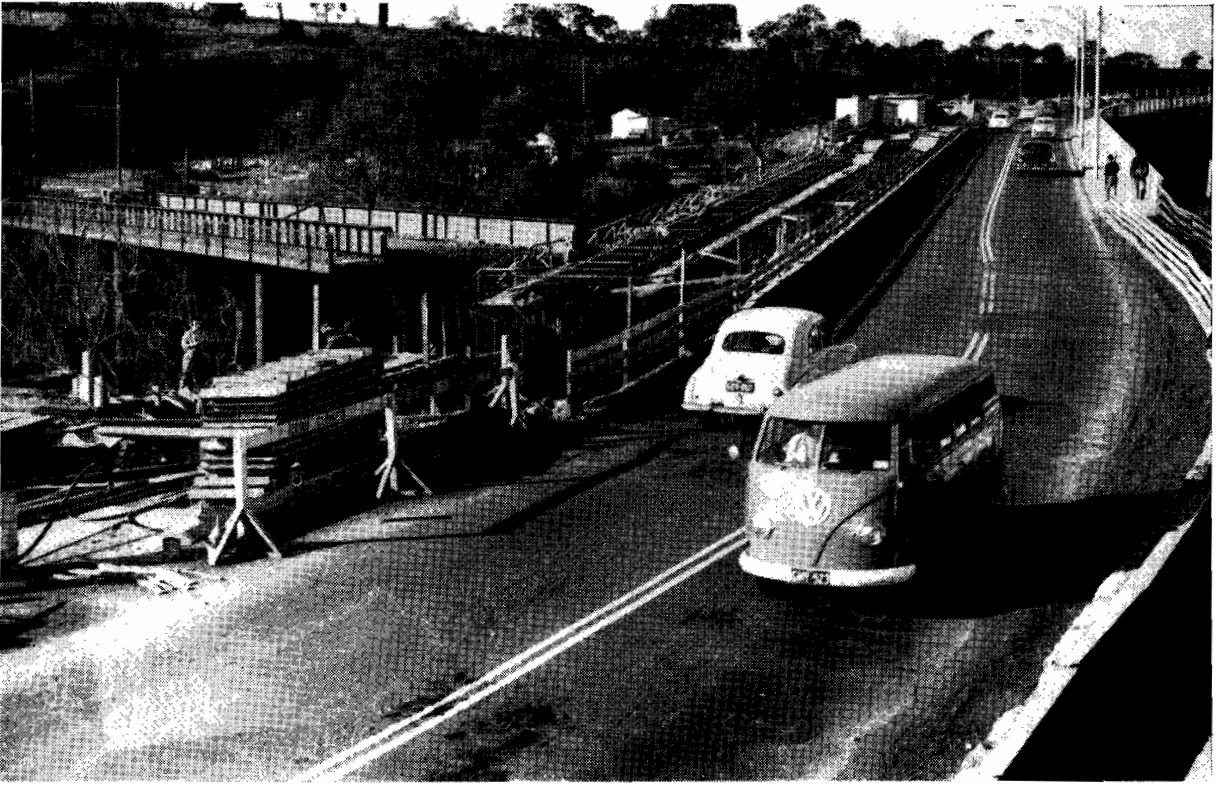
Traffic using half width of new bridge over Yarra River at Johnston Street, Cities of Collingwood and Kew.
